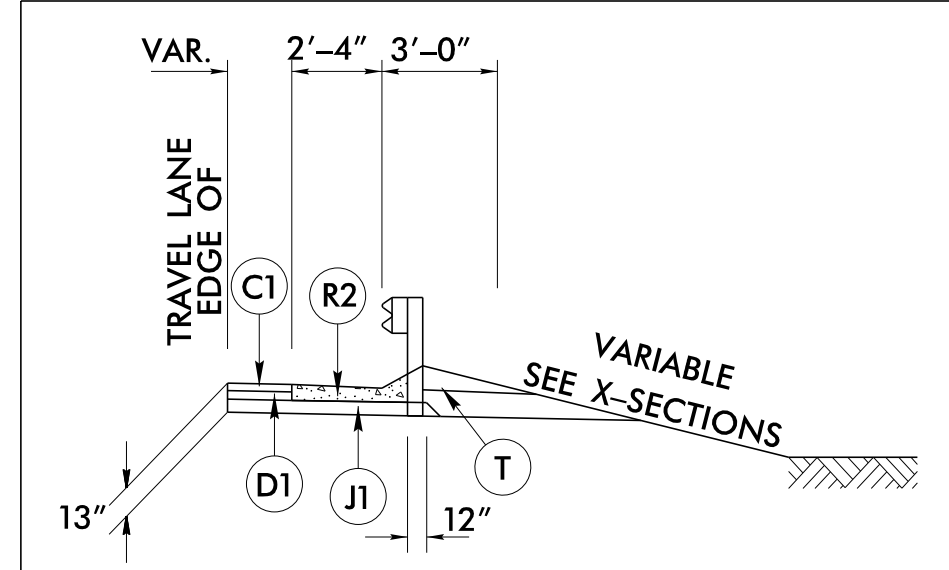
DETAIL FOR BERM IN CONJUNCTION WITH HANDRAIL
